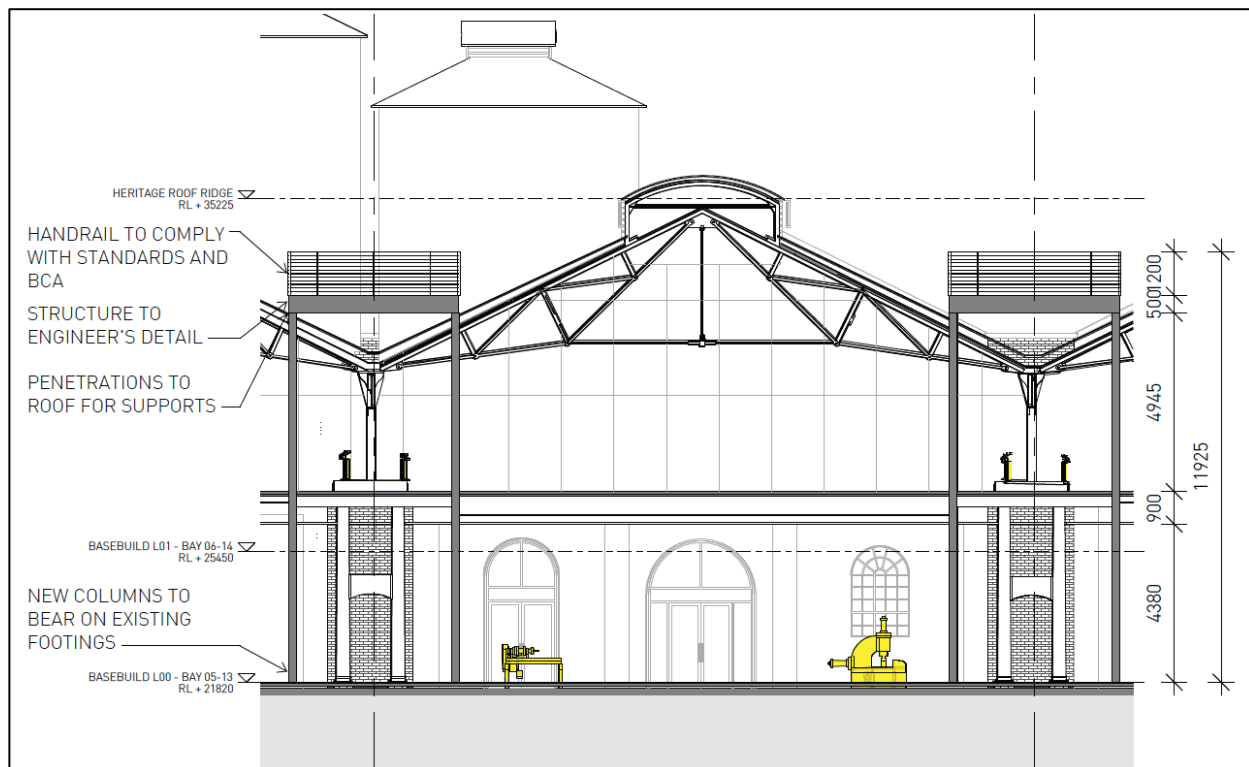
PROPOSED ROOF PLATFORM INSTALLATION (SOURCE: SISSONS)
